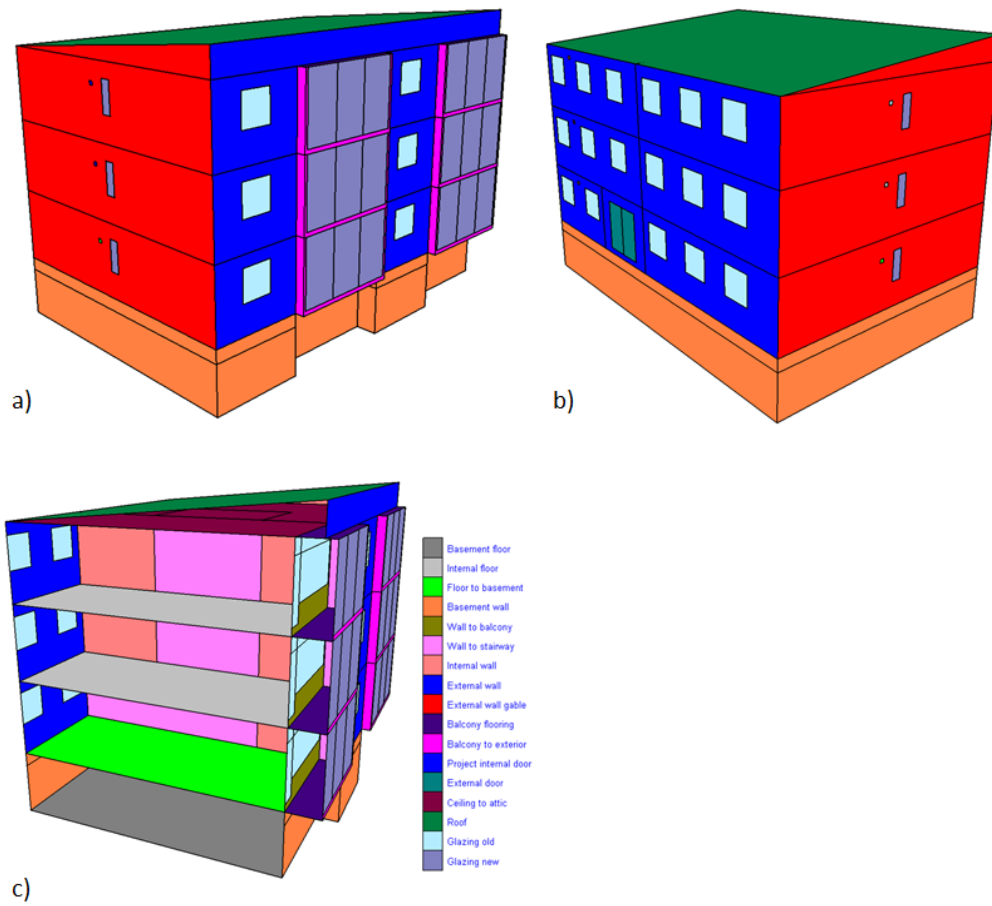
Model type B of Haanbaek demonstration building – whole staircase as thermal zone, a) South façade, b) North façade, c) Vertical section view through the model.
